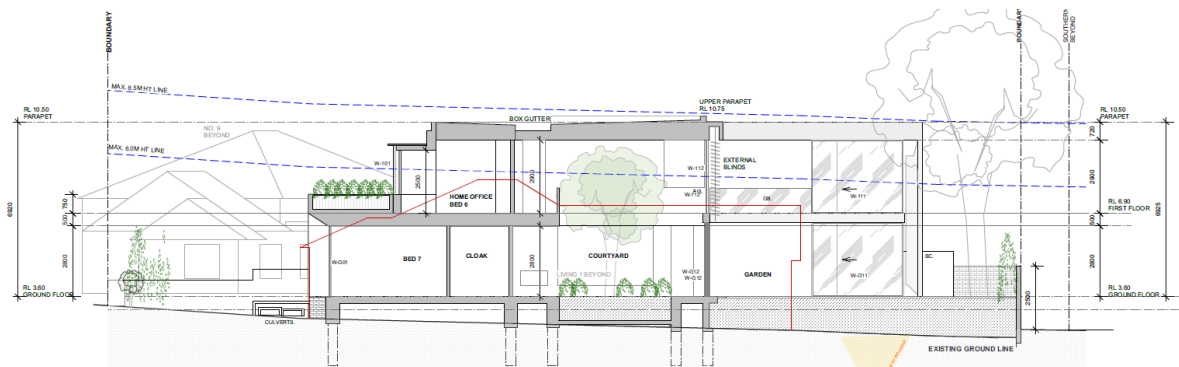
Proposed Section B-B demonstrating 6 and 8.5m building line. Existing dwelling outlined red
